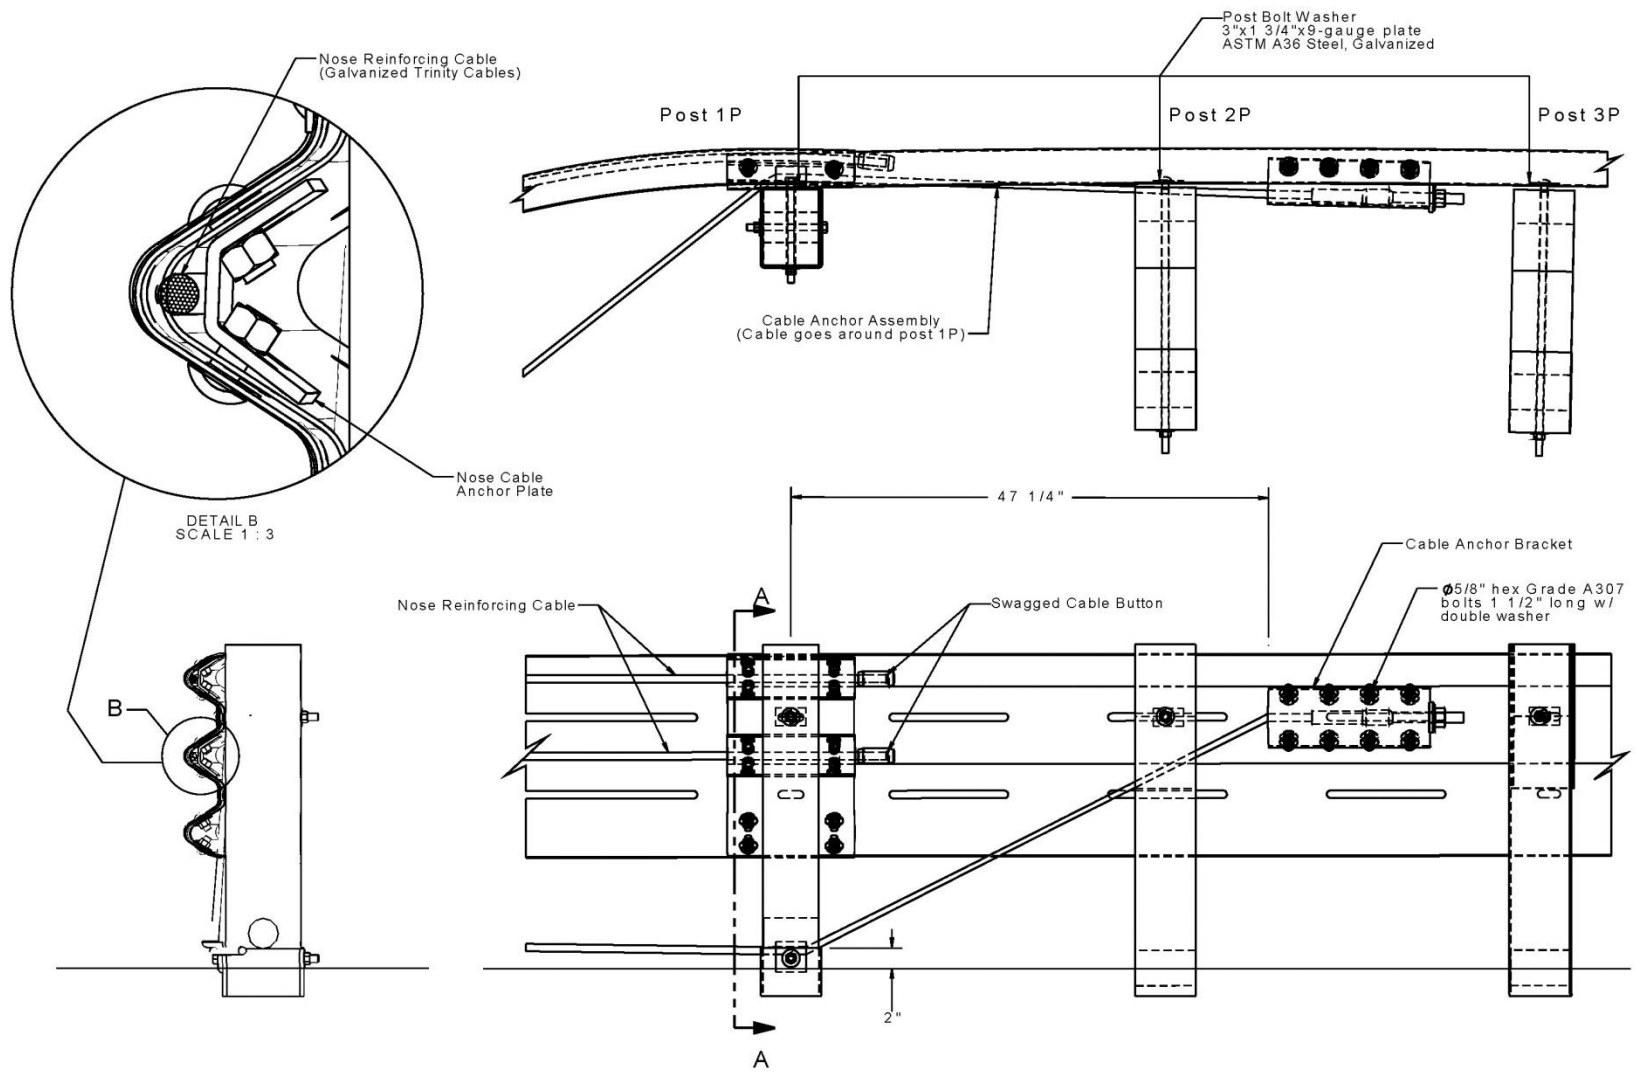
Primary Side Cable Anchorage Details, MwRSF Short Radius Design [14]
